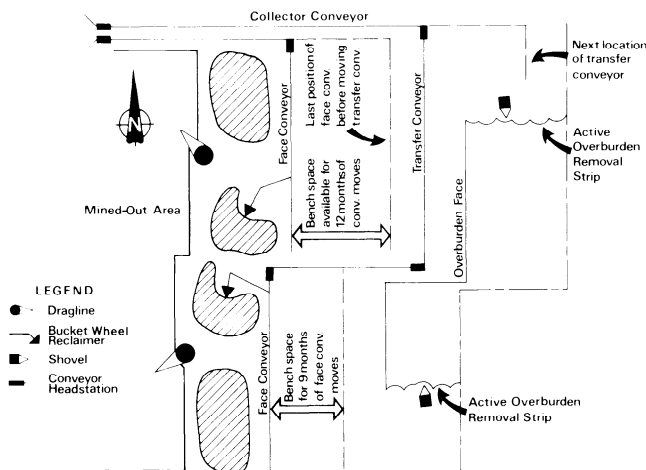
Overburden strip removal and conveyor move sequence.
